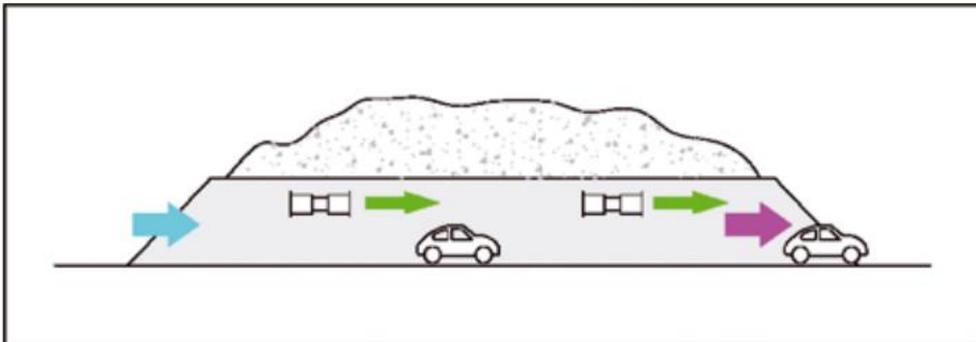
Longitudinal ventilation with jet fans in a road tunnel
